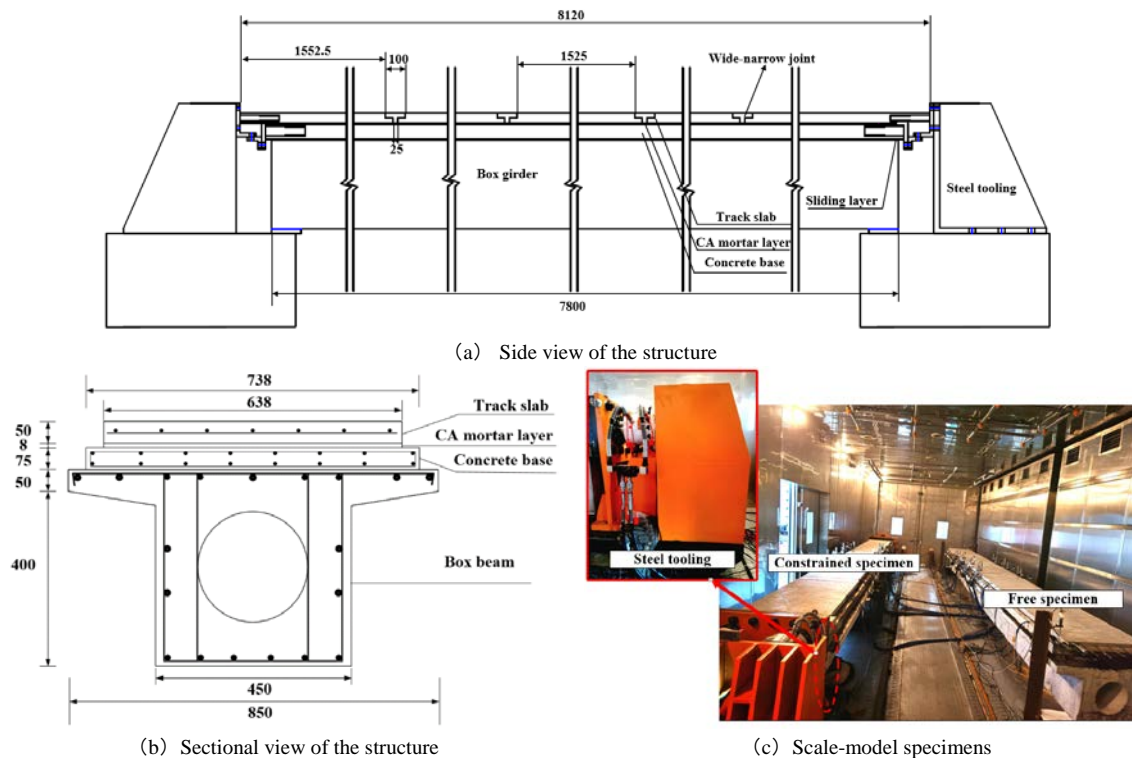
1:4 scale test model of CRTSII slab ballastless track on the bridge (unit: mm)
